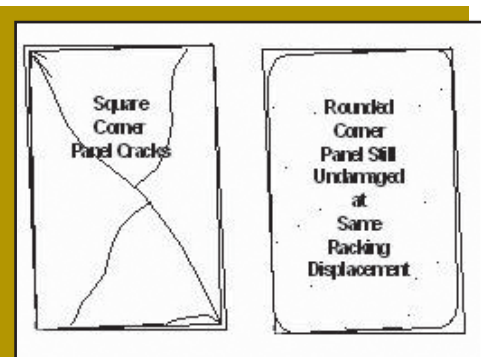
Rounded Corner Glass Panel Can Provide Greater Cracking Drift Capacity
